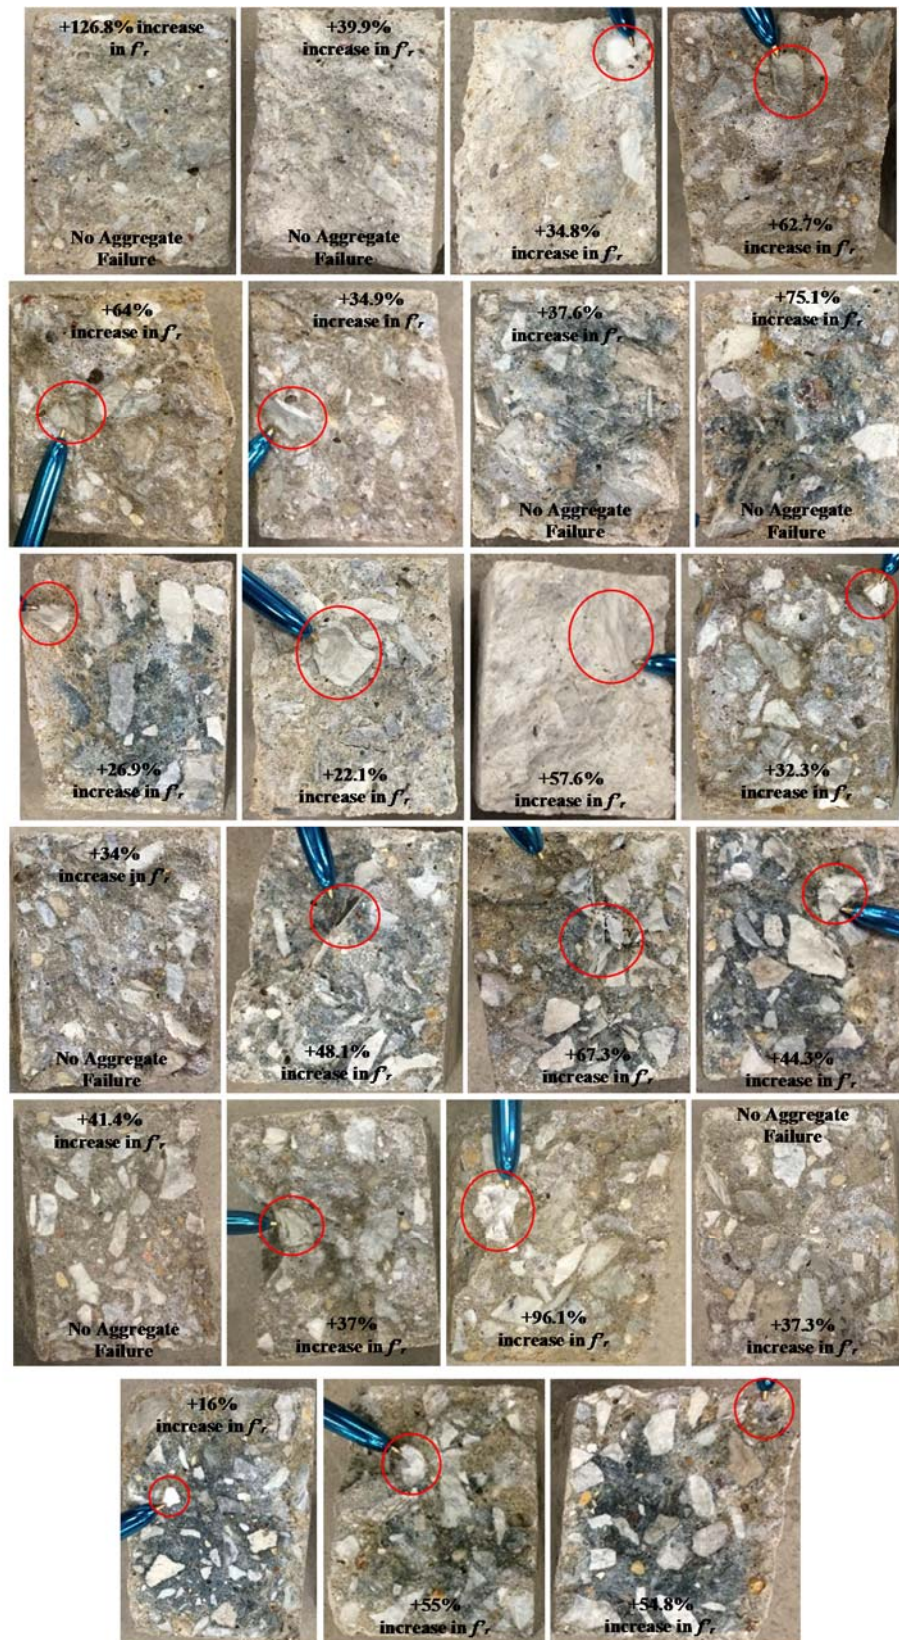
Inspection of the fractured surface after the flexure testing for freeze/thaw specimens with f_r above the upper limit
